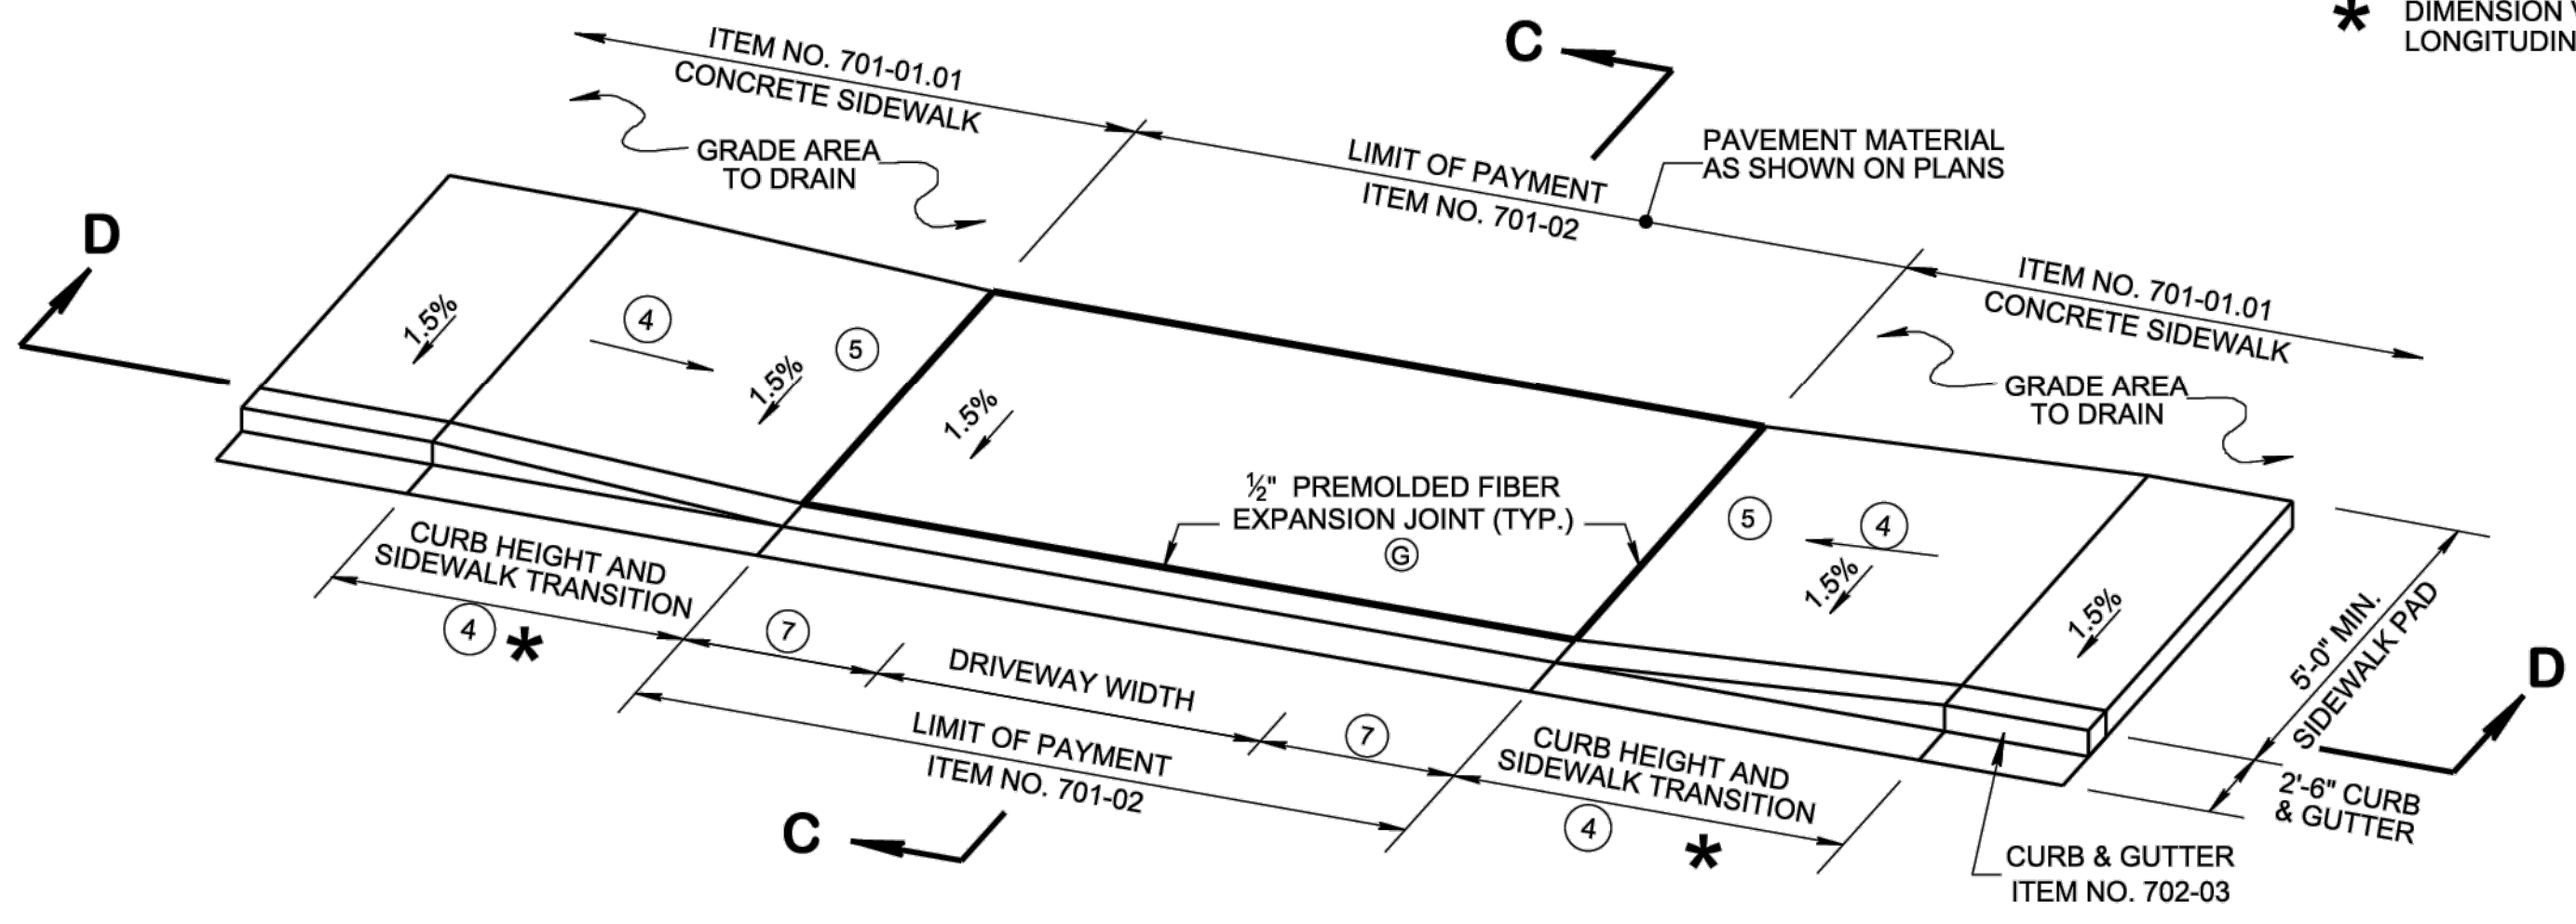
DETAILS OF LOWERED STANDARD CONCRETE DRIVEWAYS
